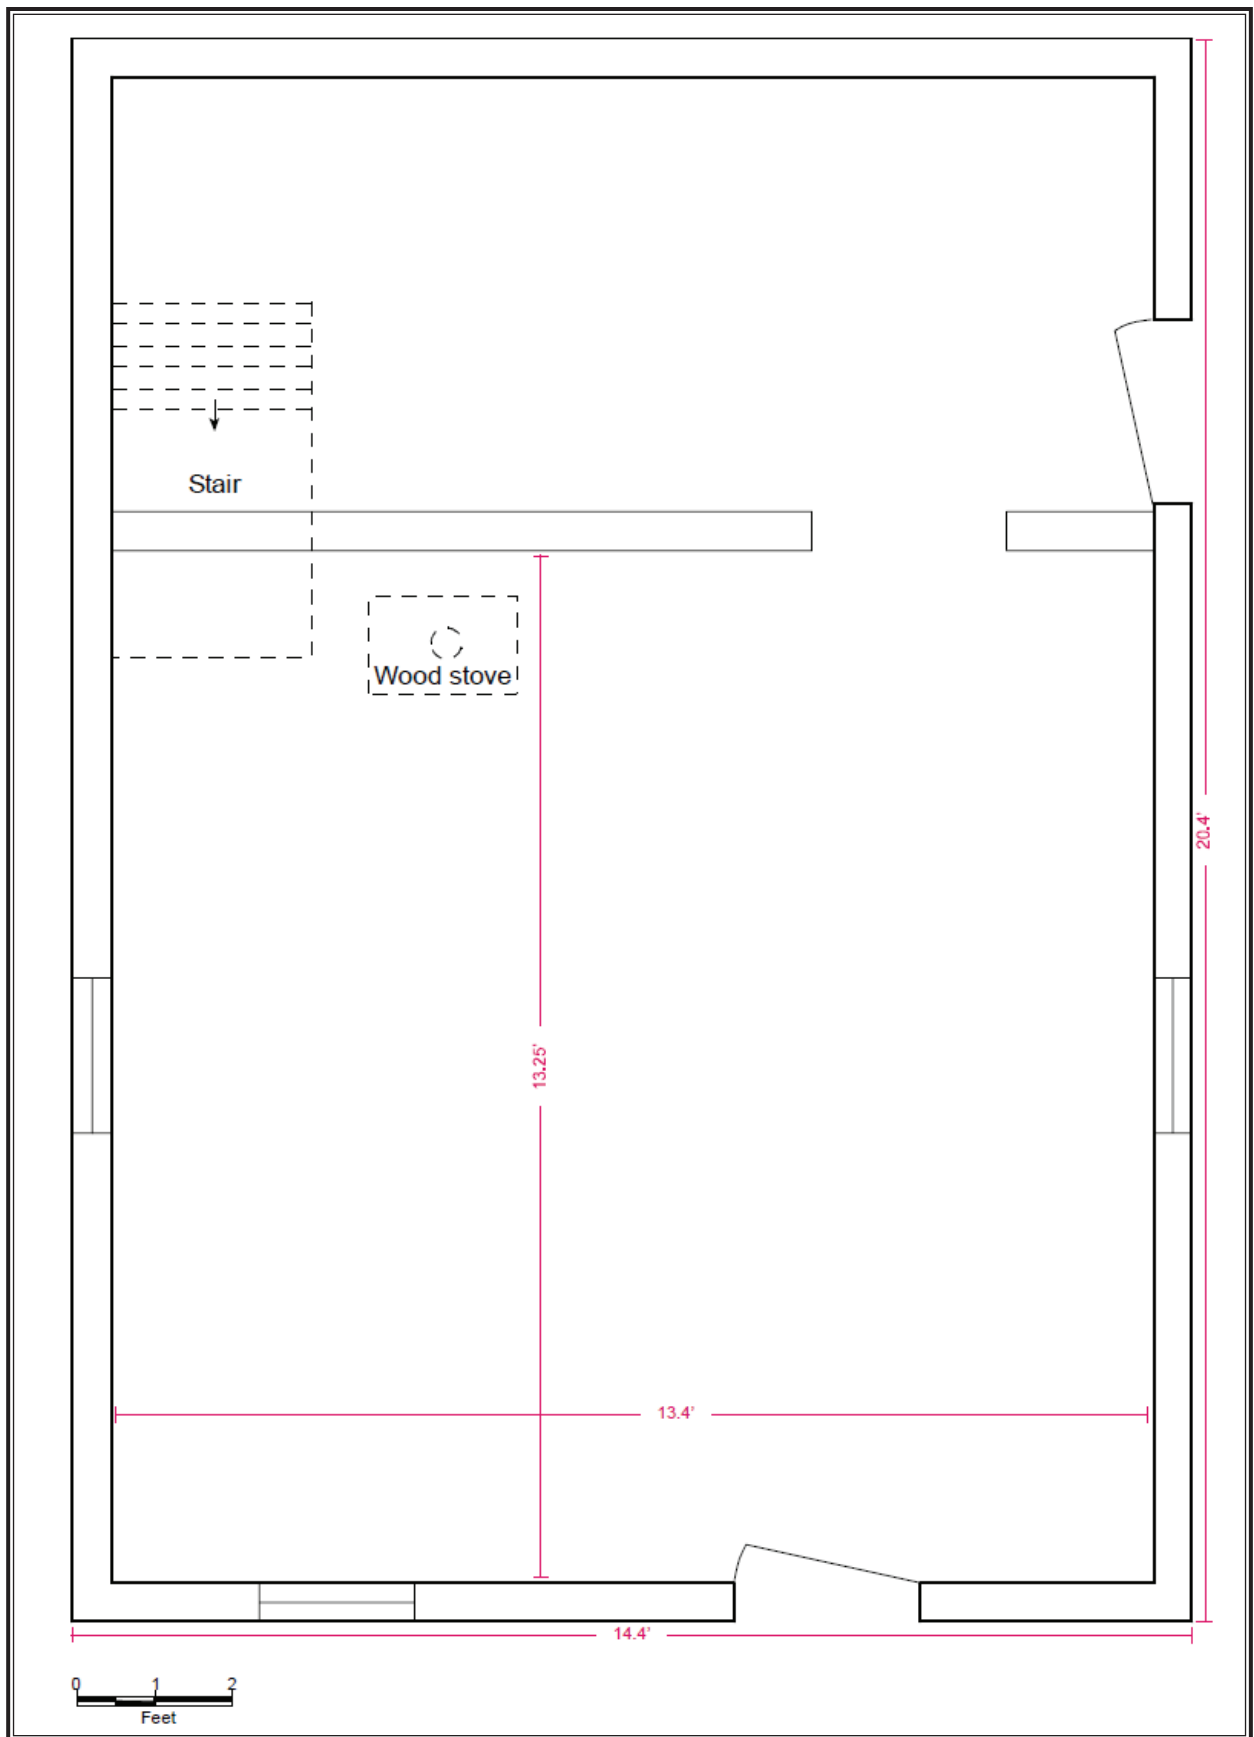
First floor plan of the Goulson frame house, ca. 1880.
